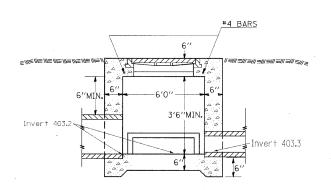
# DETAILS OF MANHOLES, SPECIAL, TYPE 1
